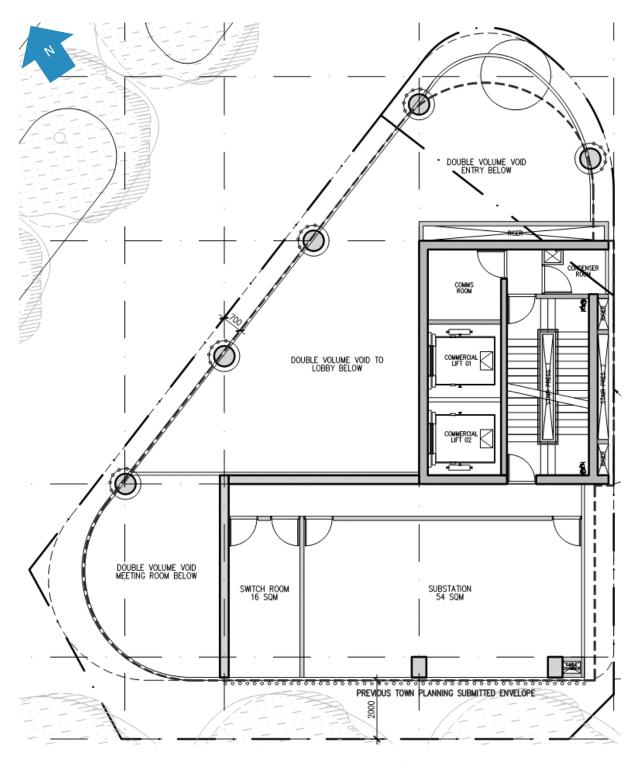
Proposed Floor Plans – Level 0 / Mezzanine (Image Source: Elenberg Fraser)
